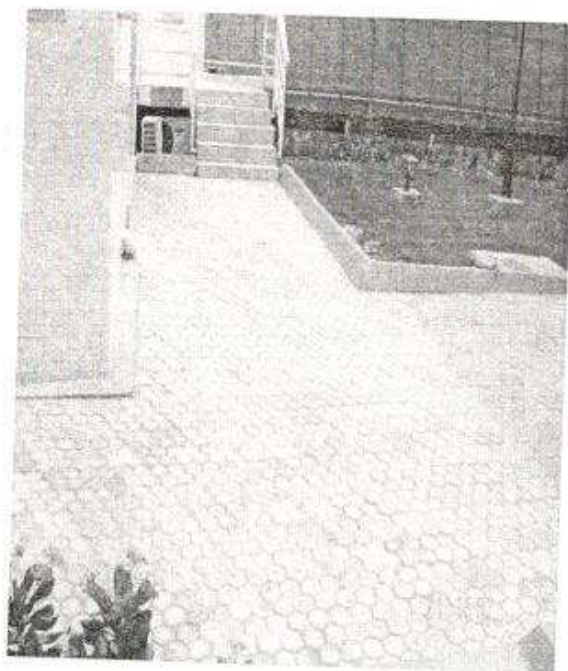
The Use of Concrete Paving Stone for Residential External Floor
